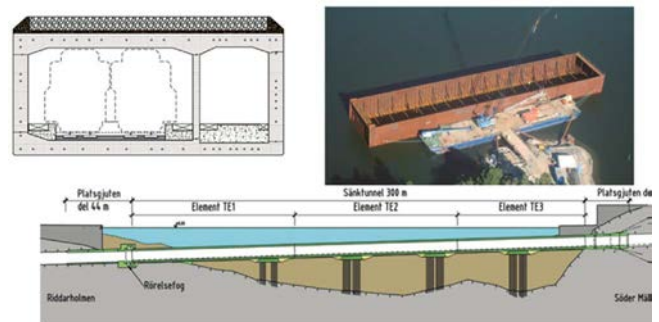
Söderströmstunnel - cross-section, concrete casting afloat and longitudinal section, Trafikkverket.
